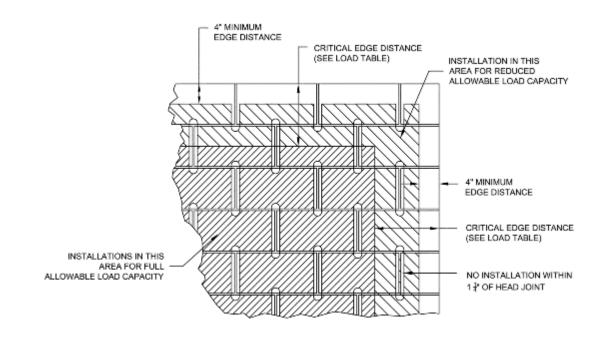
WEDGE-ALL[®] ANCHOR INSTALLED IN THE FACE OF FULLY GROUTED CMU MASONRY CONSTRUCTION (Refer to Tables 2 and 3)
